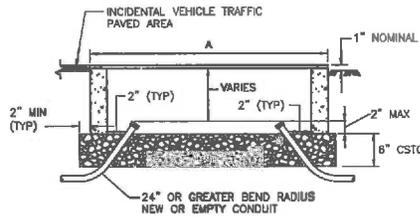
TYPE 2 JUNCTION BOX WITH 12" EXTENSION RING INSTALLATION DETAIL
